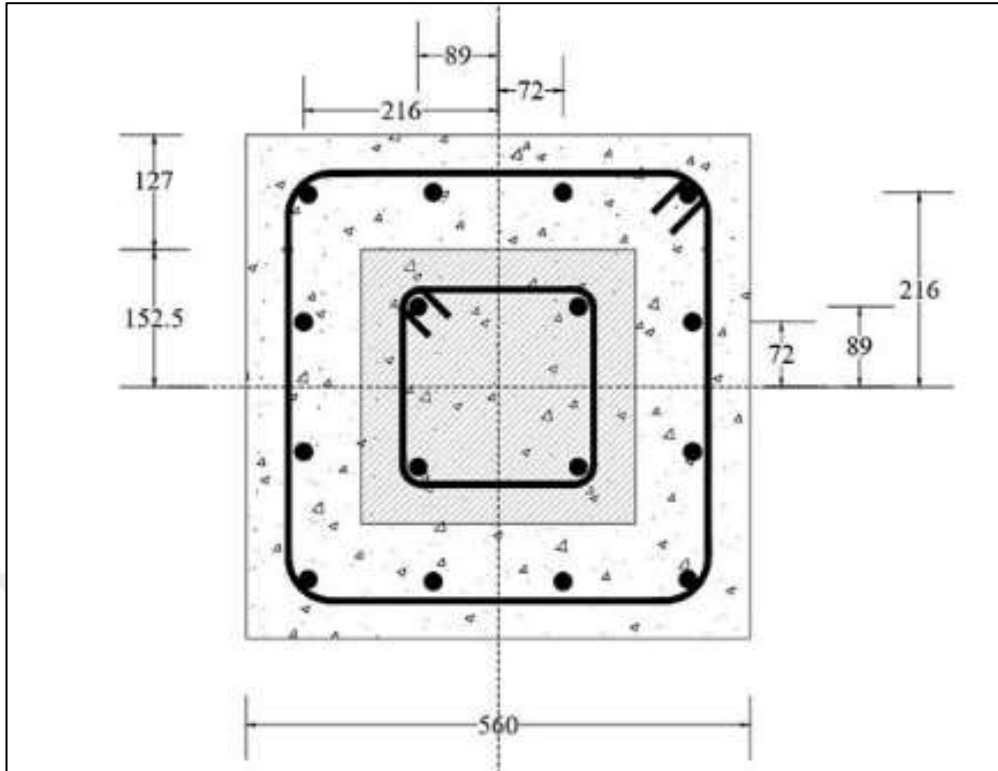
Cross-Section of The Retrofitted Column (unit: mm)[14].
